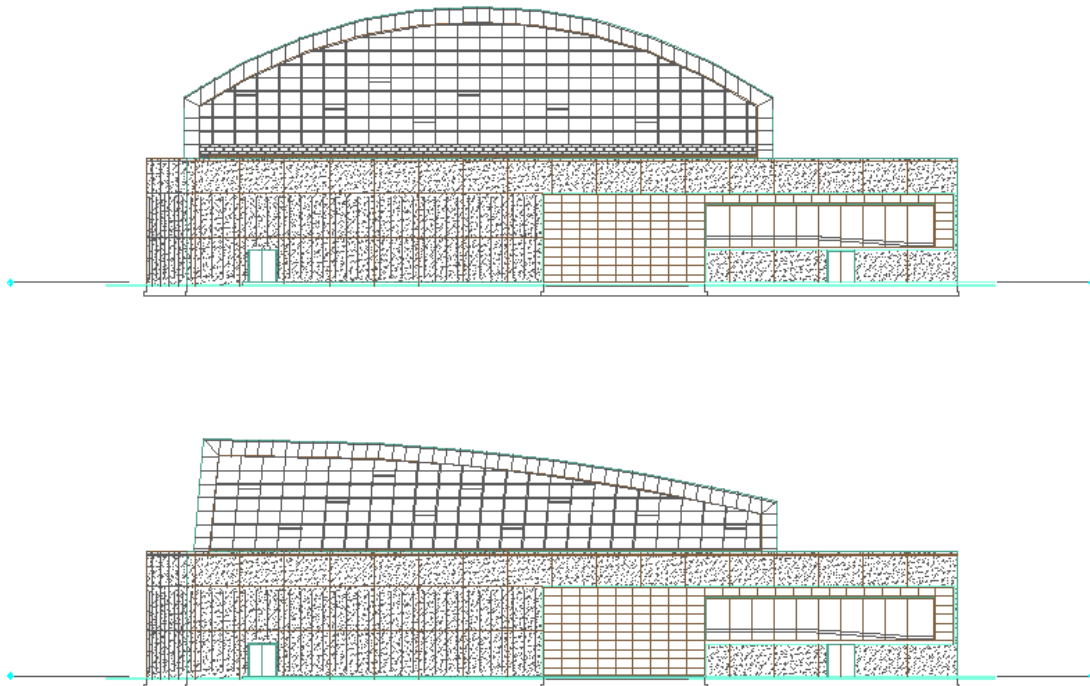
Elevation with New Roof Shape and Façade (above); Elevation with Original Roof Shape and Façade (below)
